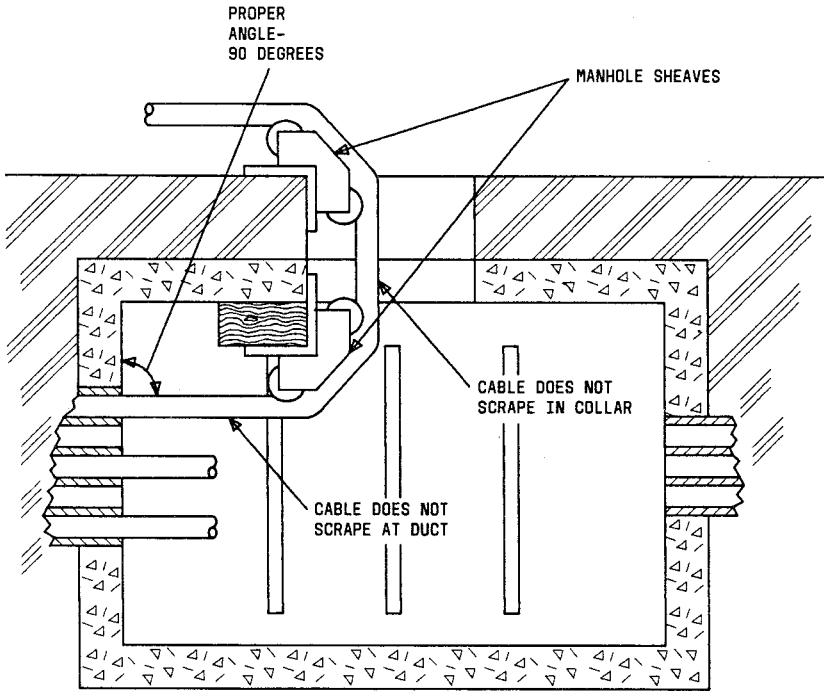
Proper Equipment Alignment Using Manhole Sheaves
